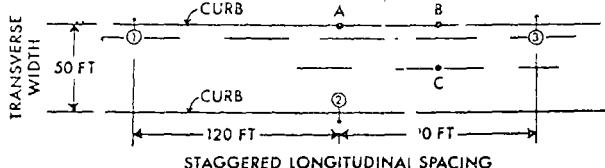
Layout of luminaire and roadway assumed for typical computation.
